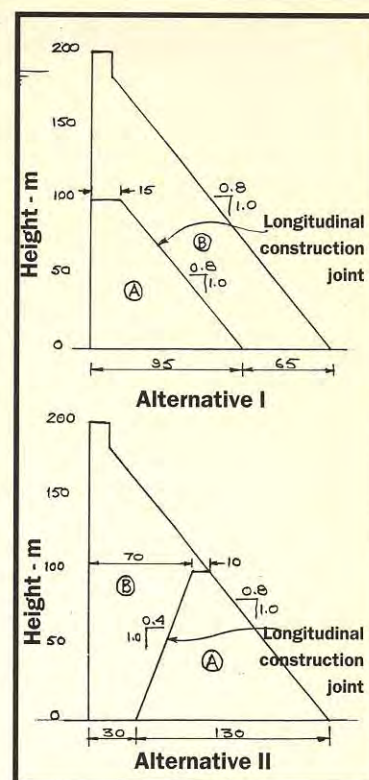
Two-stage construction of a 200m high RCC gravity dam
